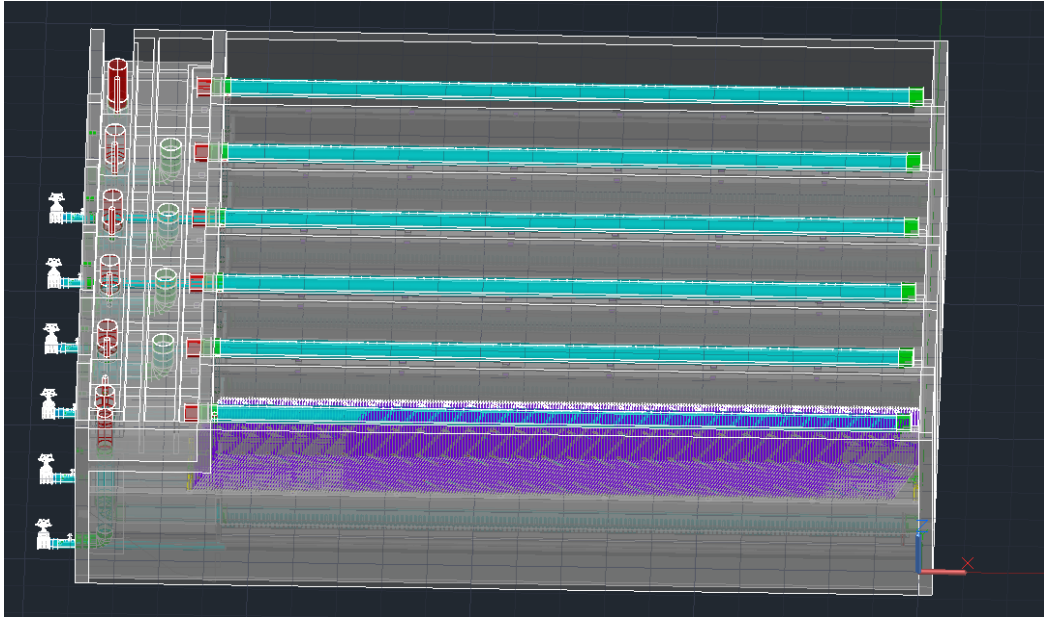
Sedimentation Tank Exit Channel AutoCAD Drawing with Outlet Pipes that Fit
